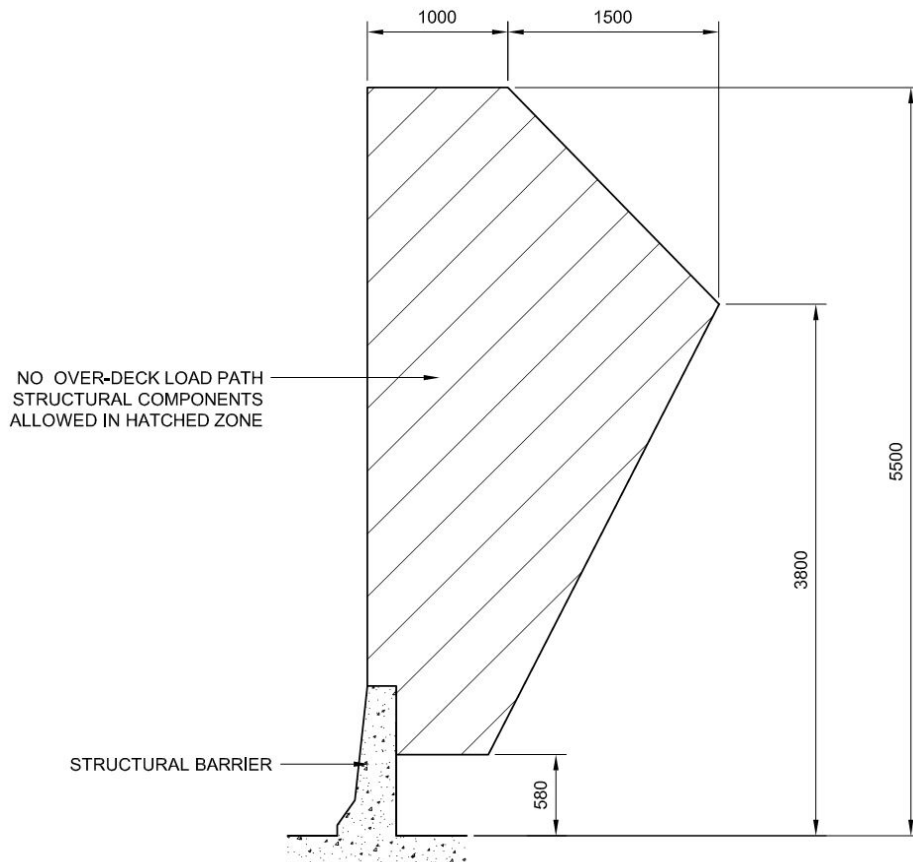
Clearance to Structural Components of Bridges with a Load Path Above the Bridge Deck
